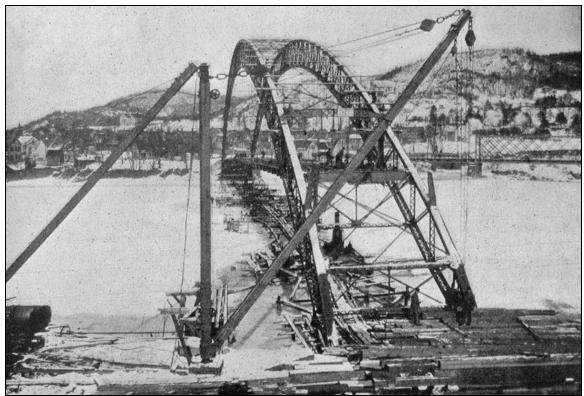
Arch Bridge under construction, winter 1904-1905 (The Engineering Record 1905).
